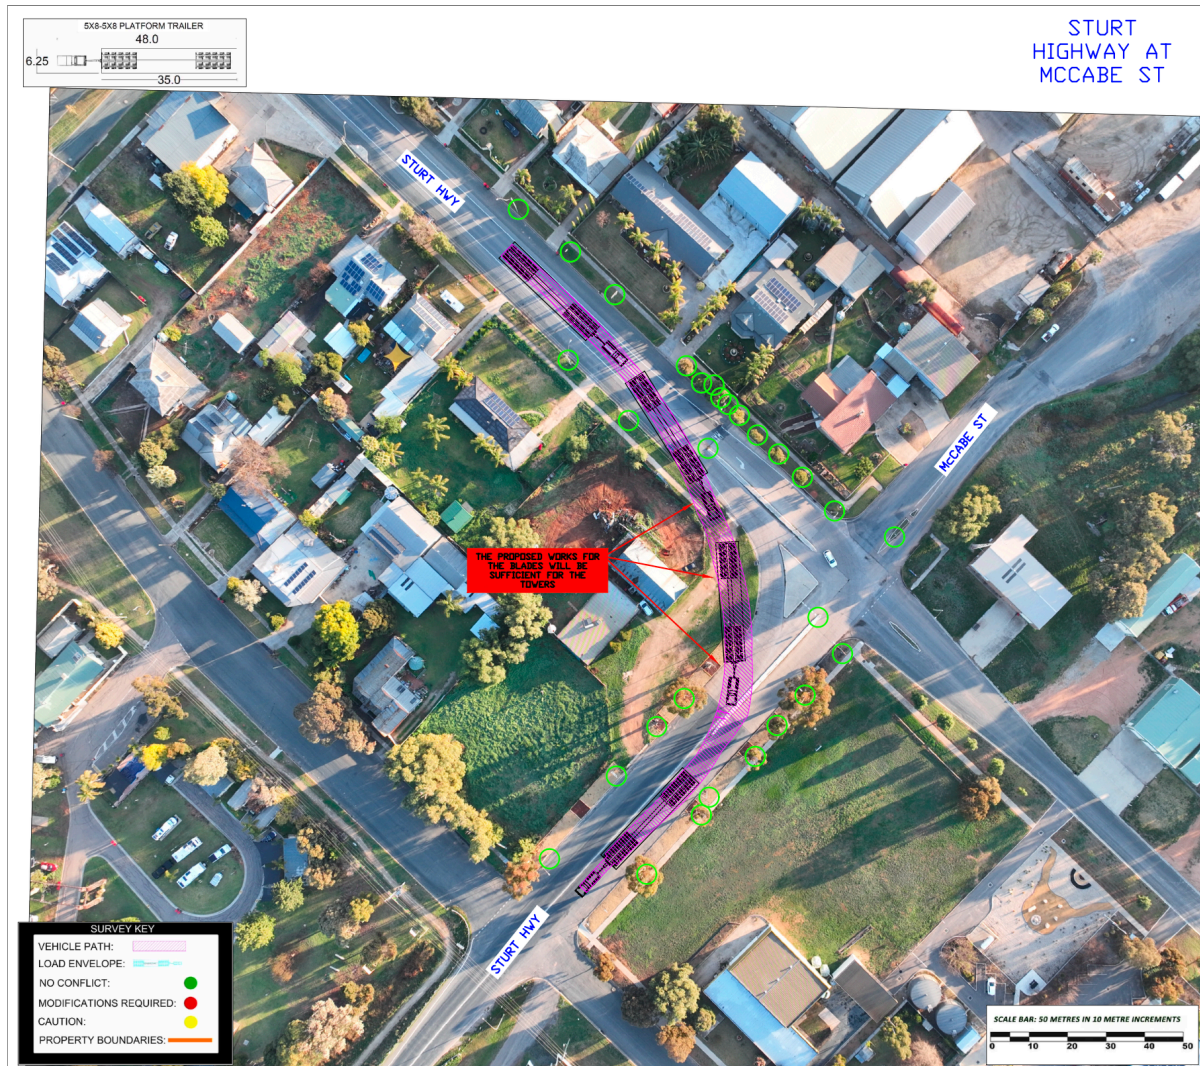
Sturt Highway intersection with McCabe St at Balranald
